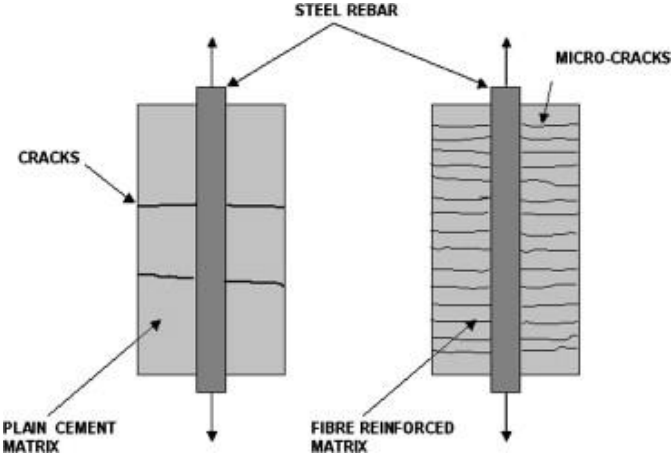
4: Crack pattern in reinforced concrete (RC) and fibre reinforced concrete (FRC) elements subjected to tension. [27]
